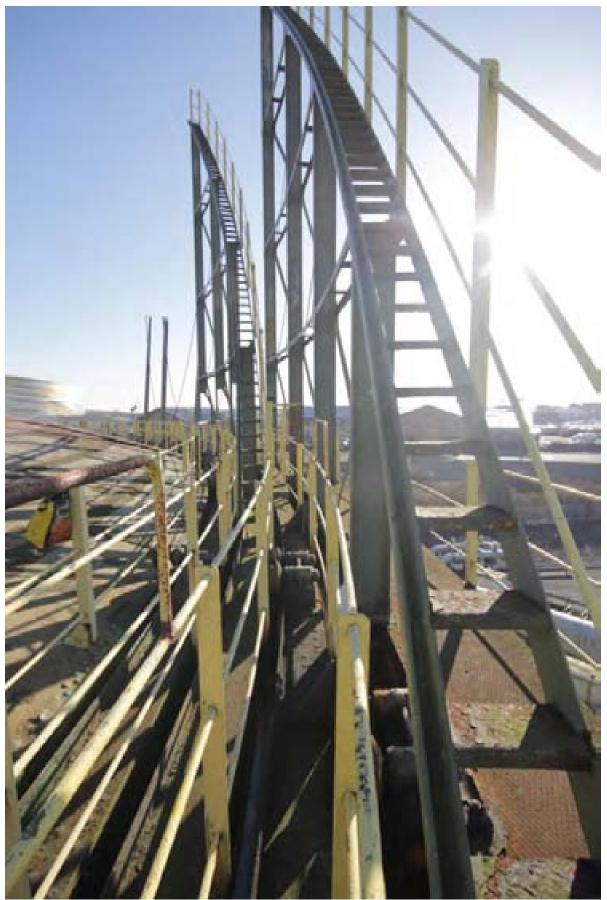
Lift stairs on Gasholder 6, note the grooved guide rail (PPD16-0083)
